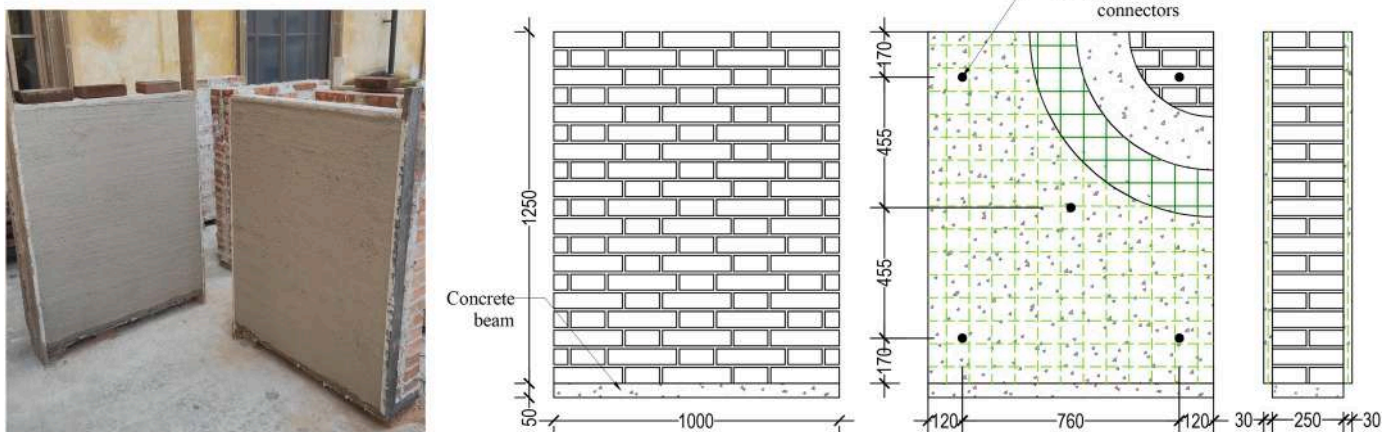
Application of CRM on solid clay brick masonry walls and geometry of unreinforced and reinforced walls.
